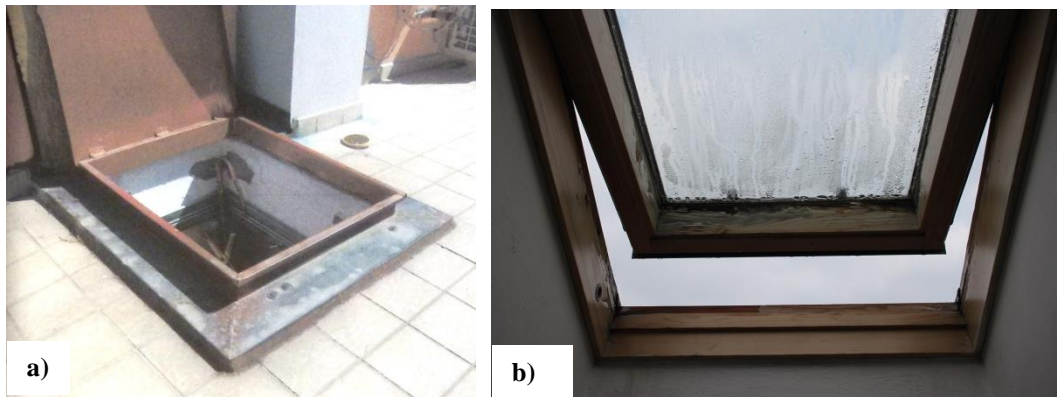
Examples of outer horizontal windows frame: a) Trapdoor; b) Skylight
